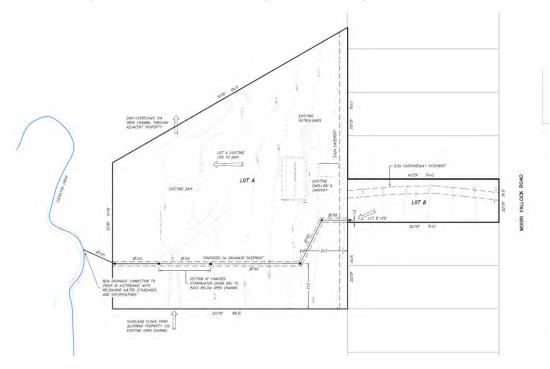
Excerpt of the subject site from the Stormwater Drainage Concept Plan
